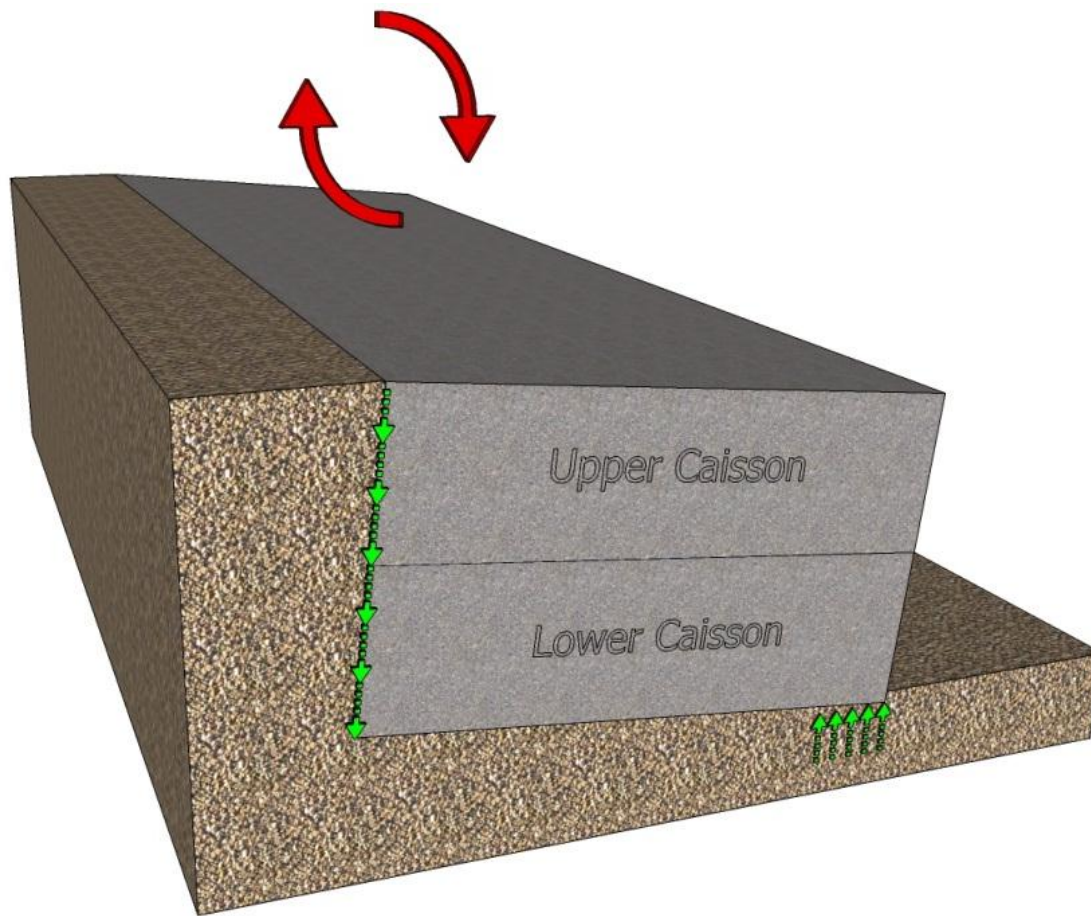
illustration failure mechanism, overturning of both caissons
